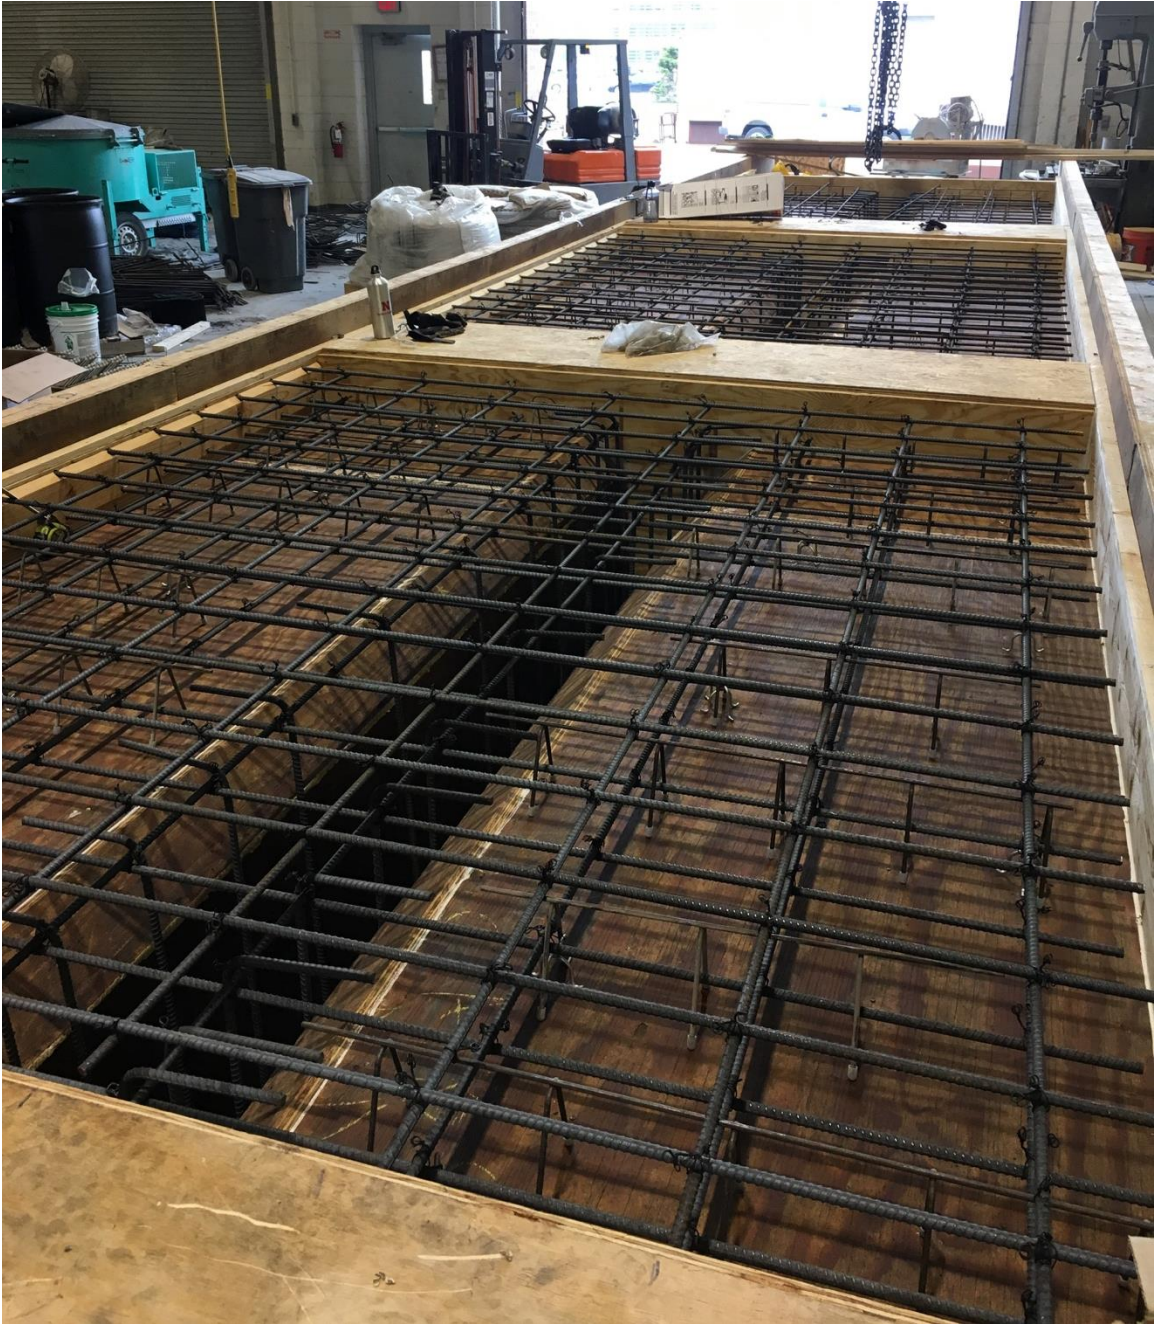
Steel Reinforcement Assembly Placed in Formwork
